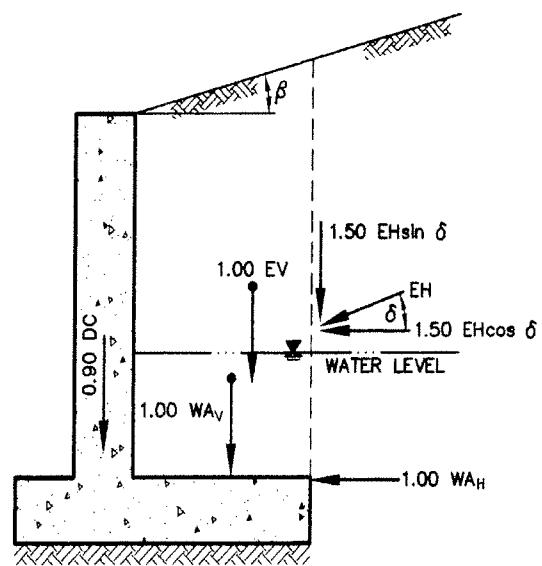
Typical Application of Load Factors for Sliding and Eccentricity.
